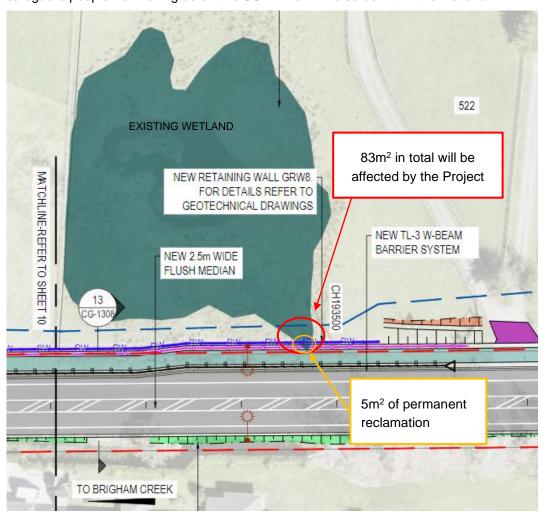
proposed works within the wetland at 522 SH16 (refer to the General Arrangement Plans in Appendix A for more details)
